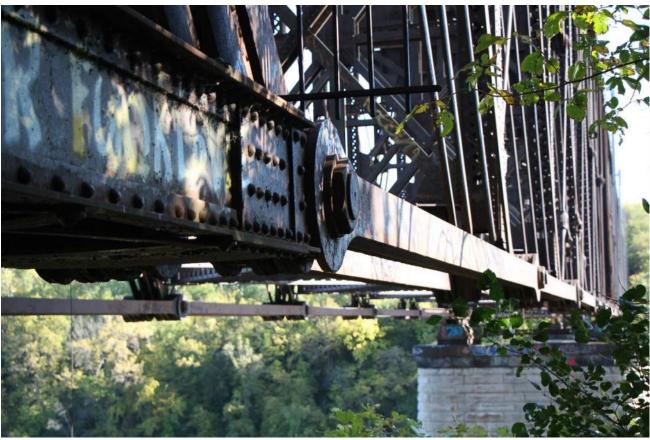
Typical lower chord pin and eyebar, south face looking east
